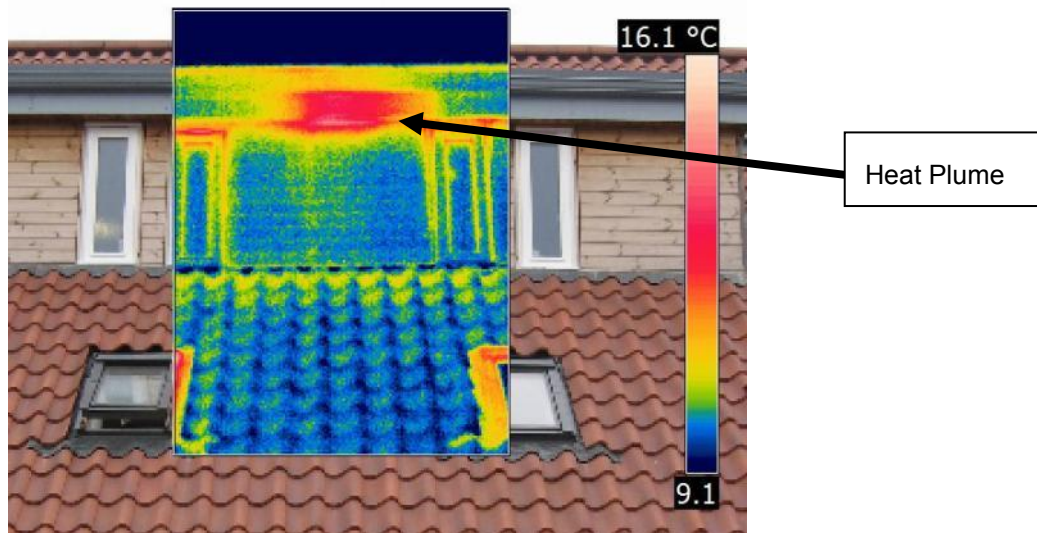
Thermal Image of Heat Plume around Dormer Window due to Party Wall Bypass
